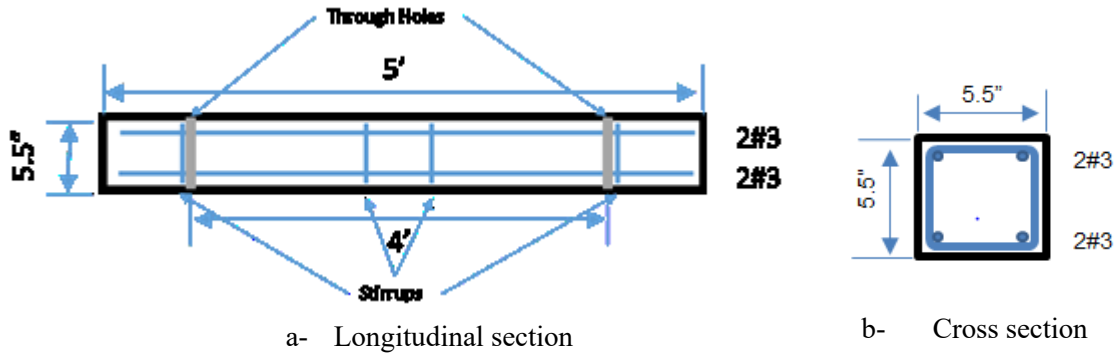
Specimen reinforcement and dimensions (1in. = 25.4 mm).
